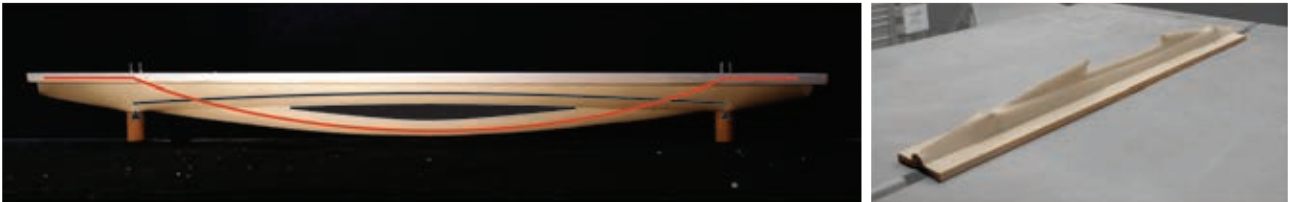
Beam 8 - design (l) and broken beam (r).
